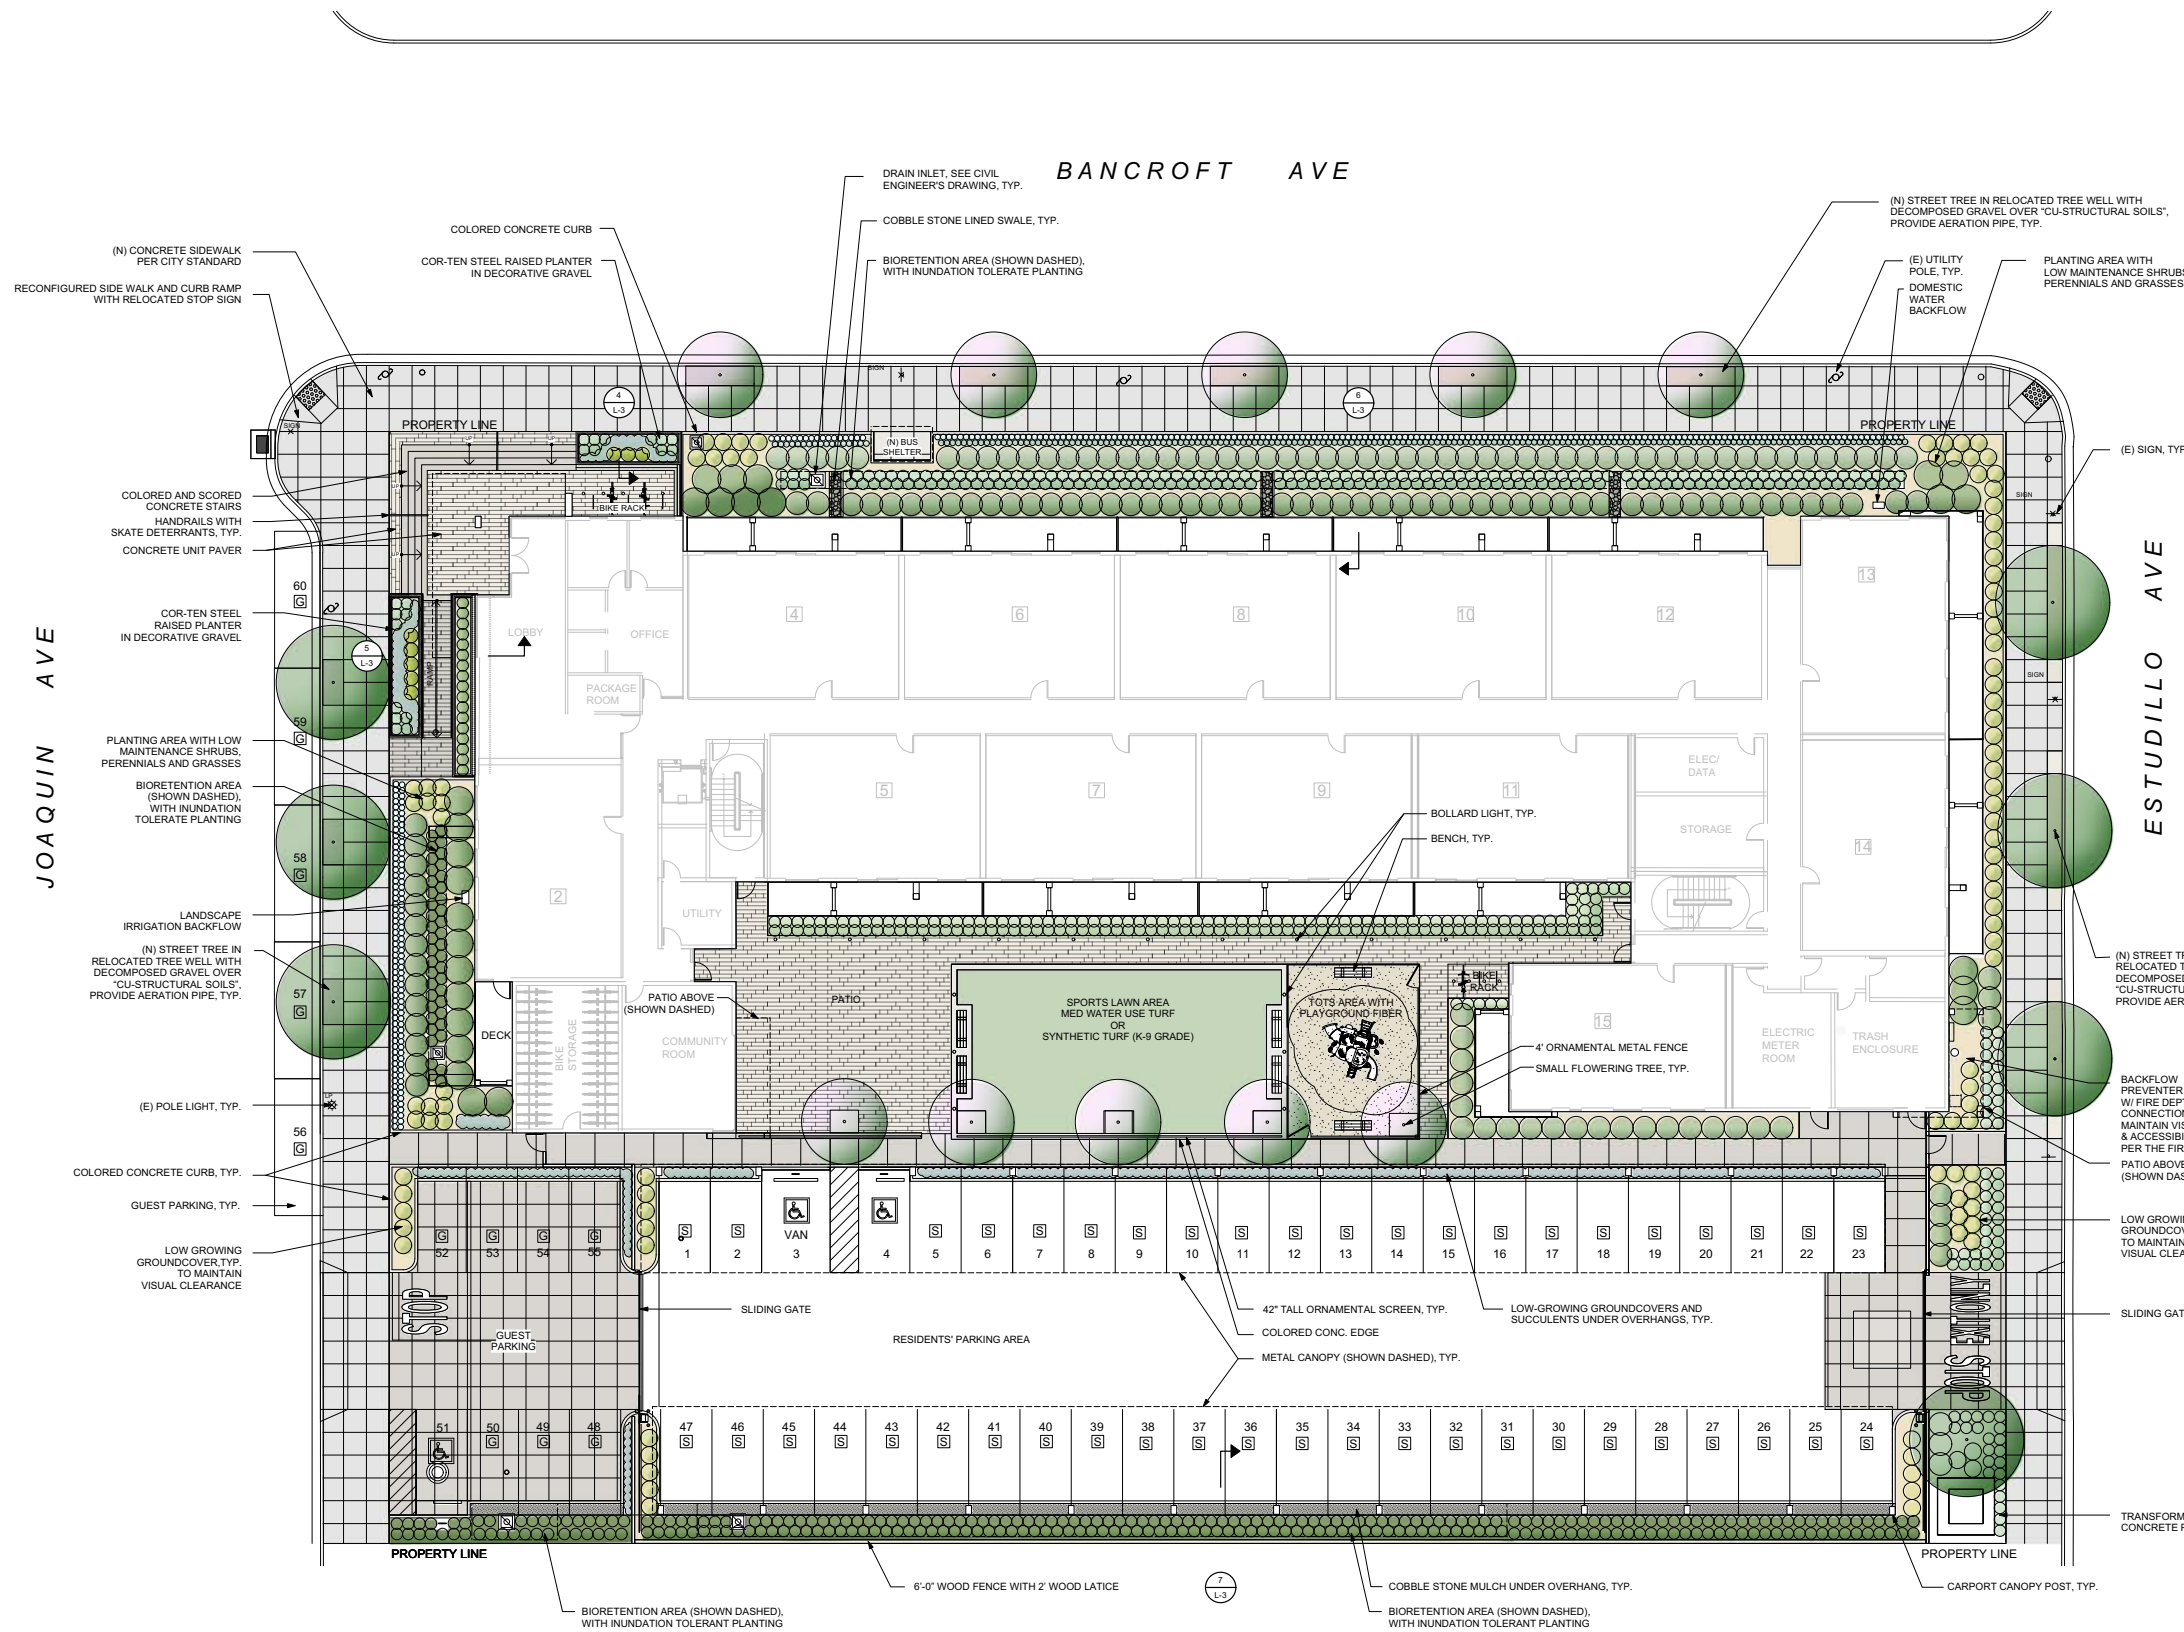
EXHIBIT P - LANDSCAPING MATERIALS PLAN - GROUND FLOOR
